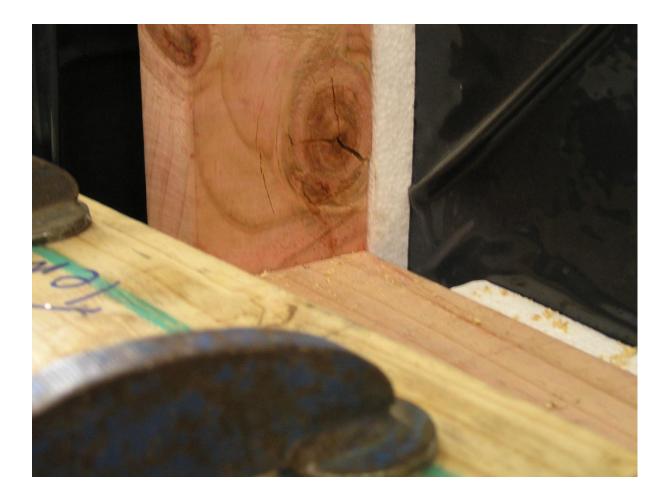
Stud cracking at a knot at 5.5 kPa and stiffening piece G-clamped to strongback
